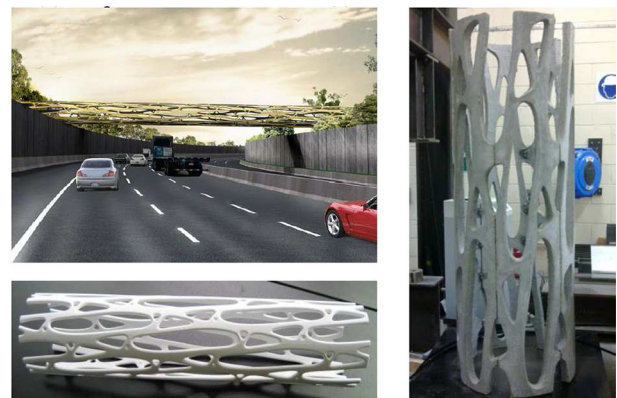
BESO periodic design of a footbridge: proposal of the footbridge (left top), 3D printout of a section (left bottom), reinforced concrete prototype of a section (right) [56]
